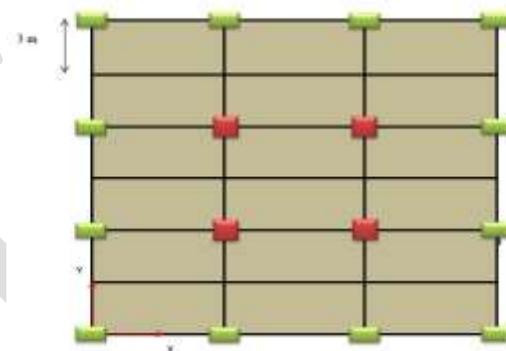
Models I - Slab with Main and Secondary Beam at Spacing 3m
